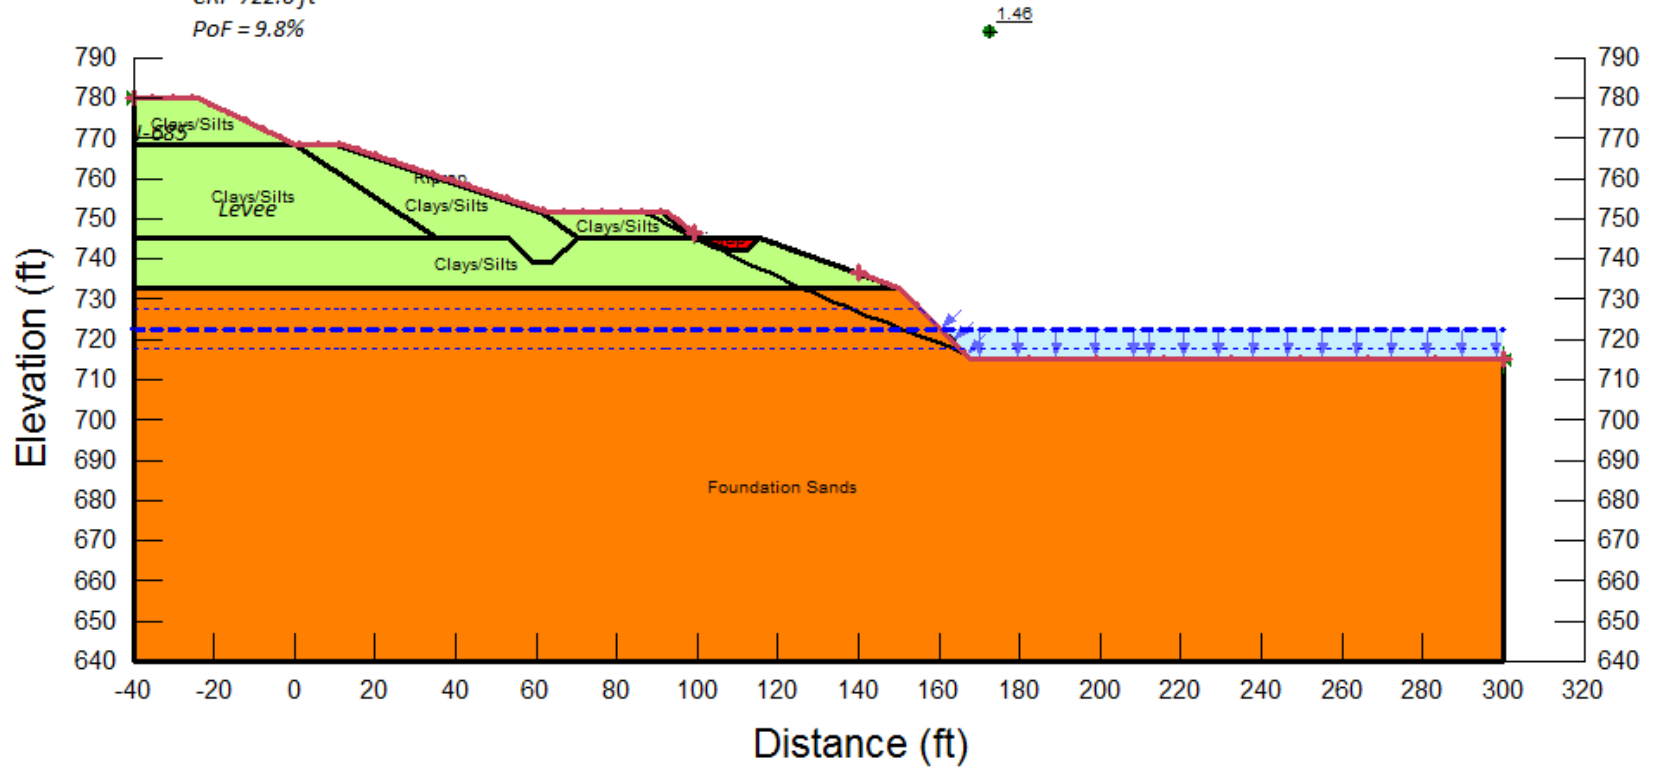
Riverside Slope Stability Results for CID Kansas Levee Station 1+00 under Existing Conditions with Water Elevation near CRP
